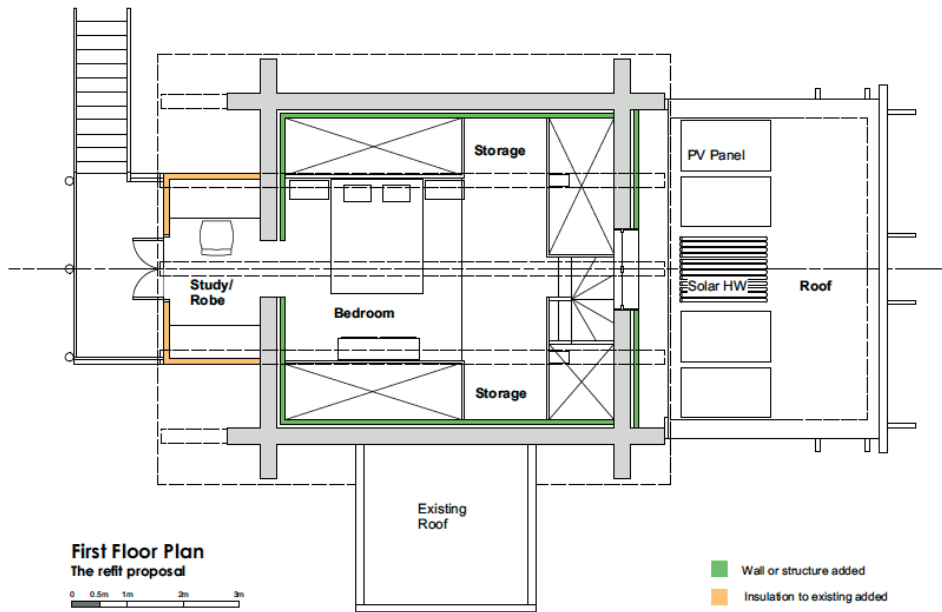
The combined student concept design, first floor plan (Bahho, 2018, p.177).
